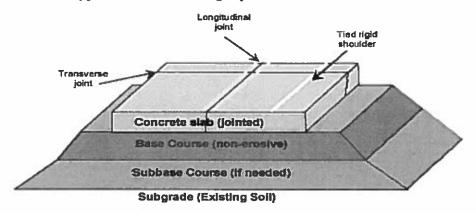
Typical Section for a Rigid Pavement (1/)
